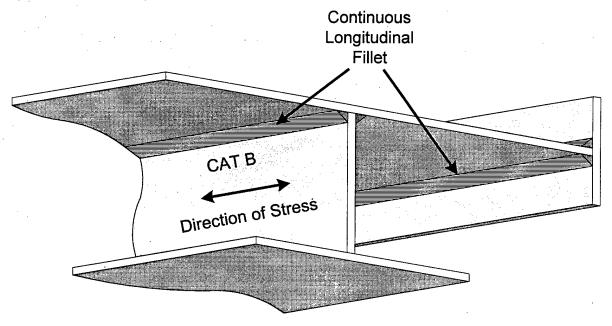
Continuous Longitudinal Fillet Weld CAT B
